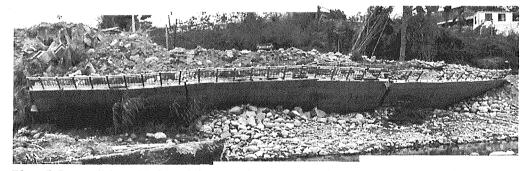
Large tilting of RC retaining wall (near Shih-Wui Bridge; site 5 in Fig.1)
